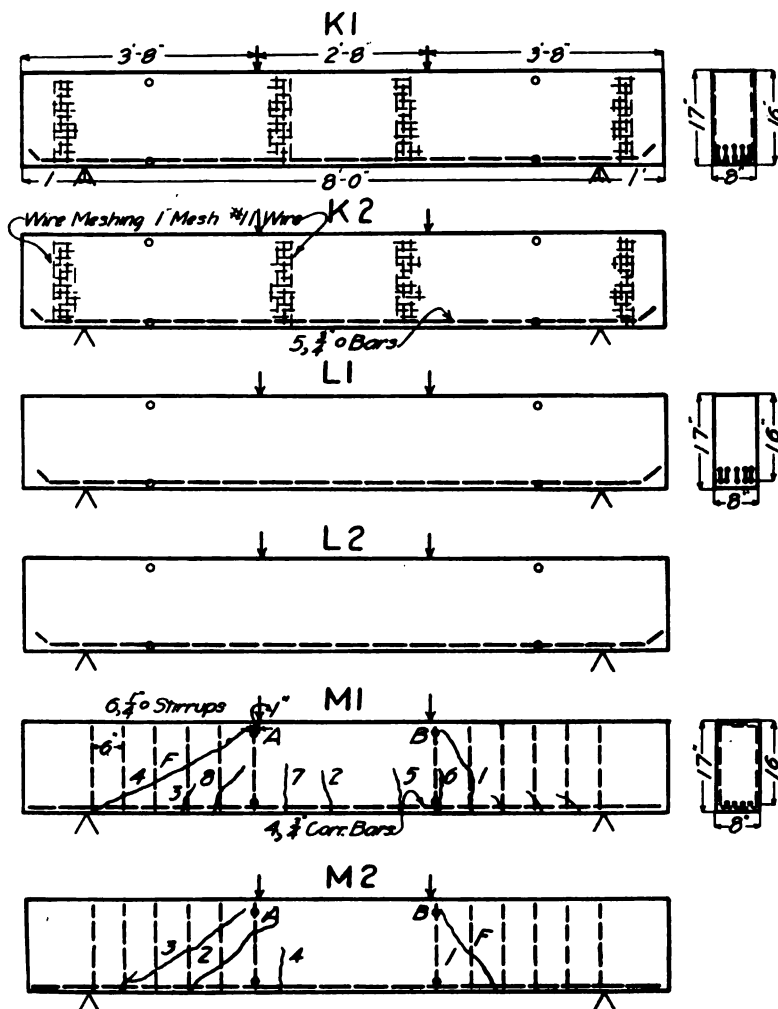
BEAMS OF SERIES G—REINFORCEMENT AND CRACKS.
